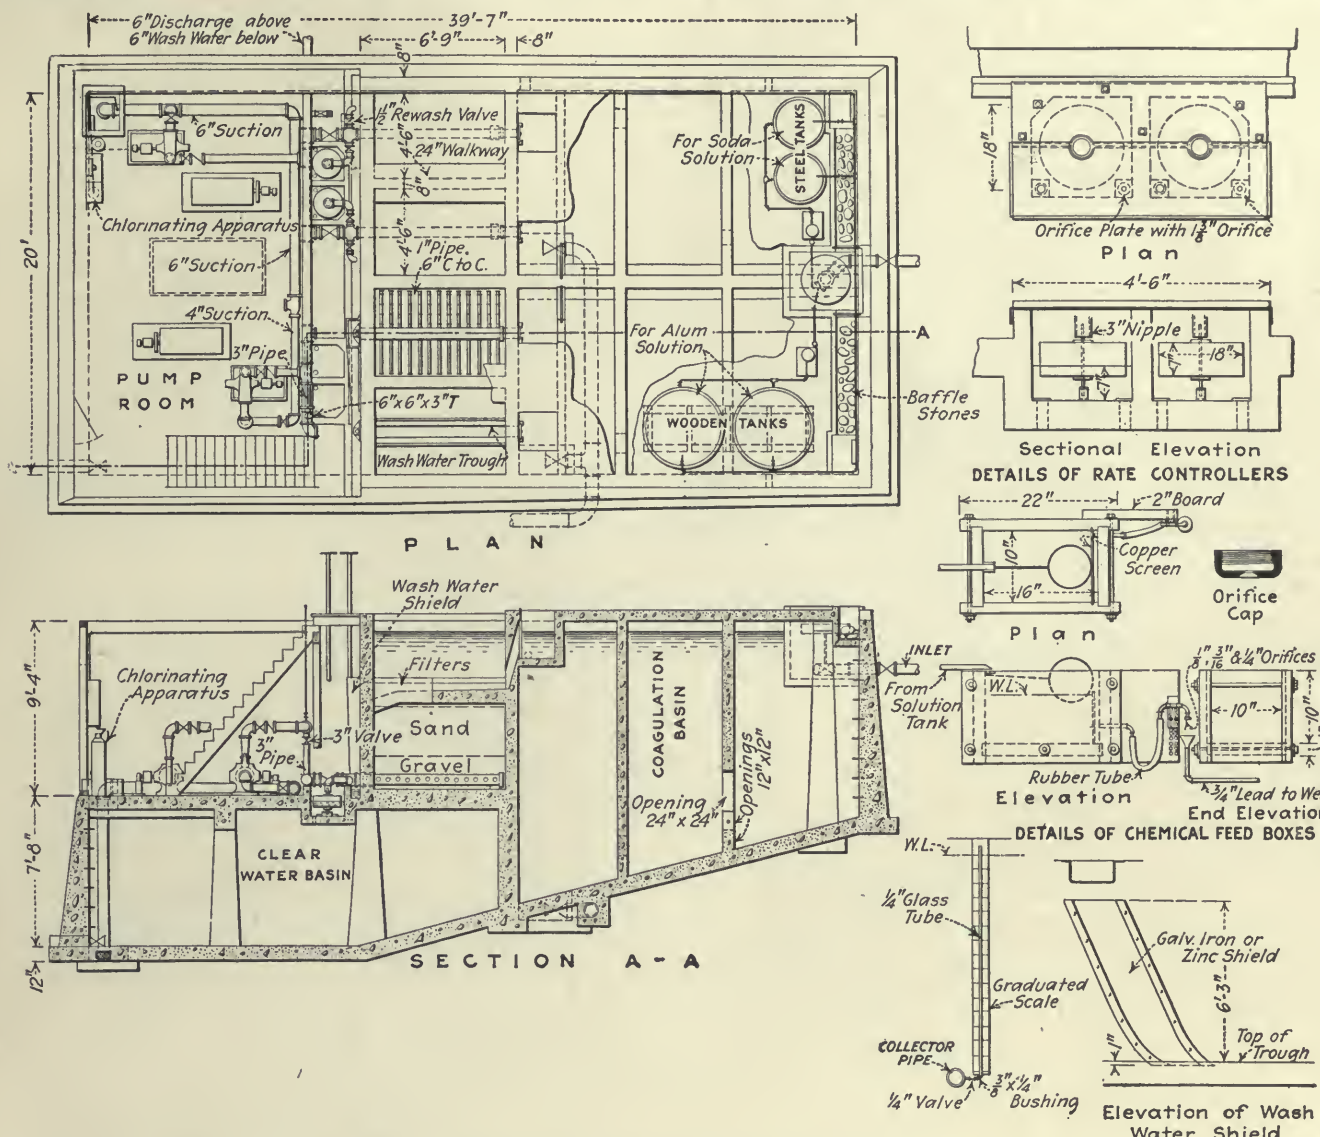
ONE OF THE LARGER CONCRETE WATER-FILTRATION PROJECTS ON WHICH THE AMERICAN ARMY ENGINEERS ARE AT WORK IN FRANCE
